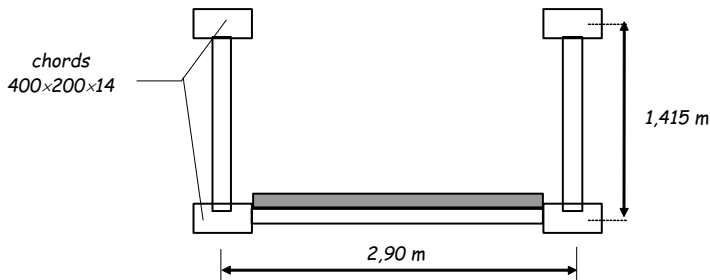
Cross-section of footbridge with 14 mm thick chords and 1.415 m deep trusses
